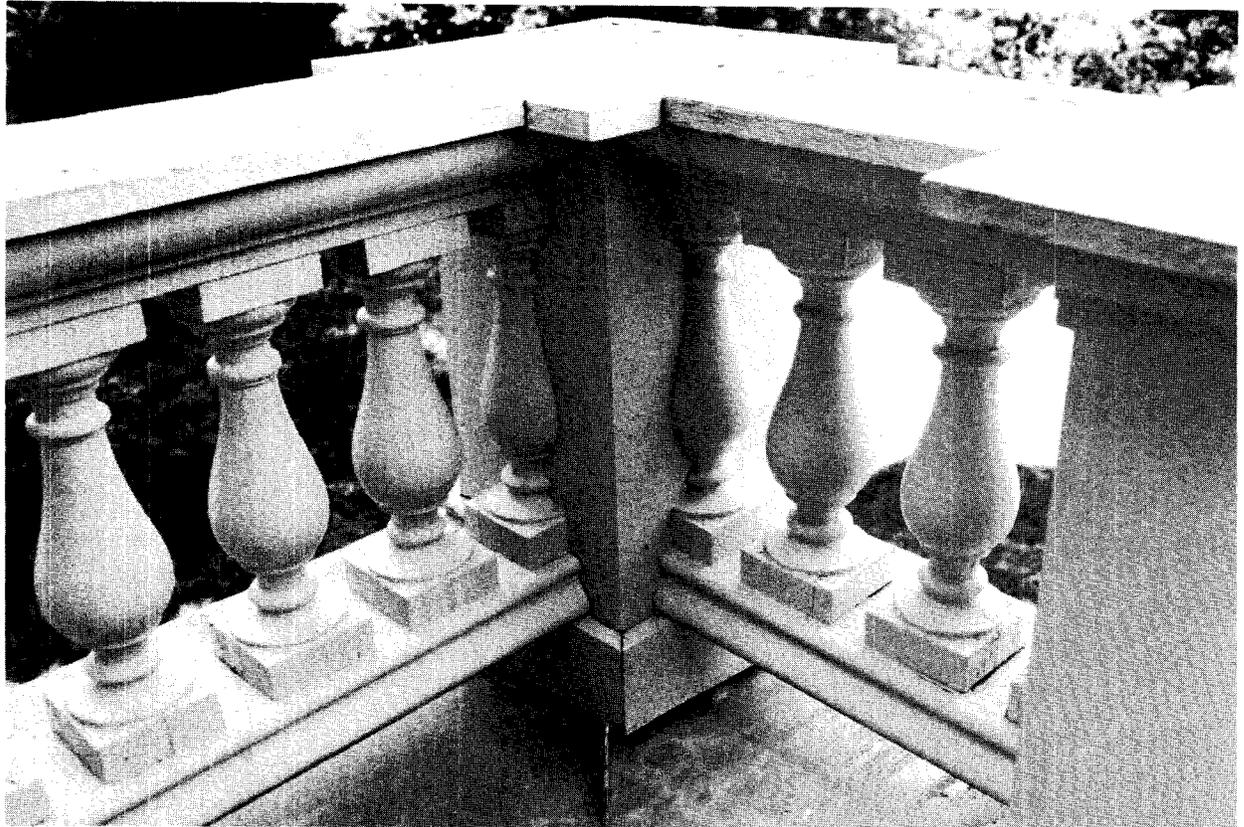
Penniman House: Roof Balustrade of West Portico (1984).
